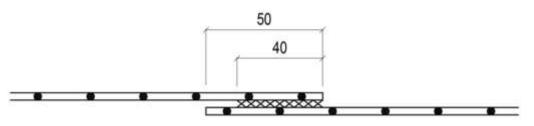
A single-track hot-air weld made with an automatic welding machine
